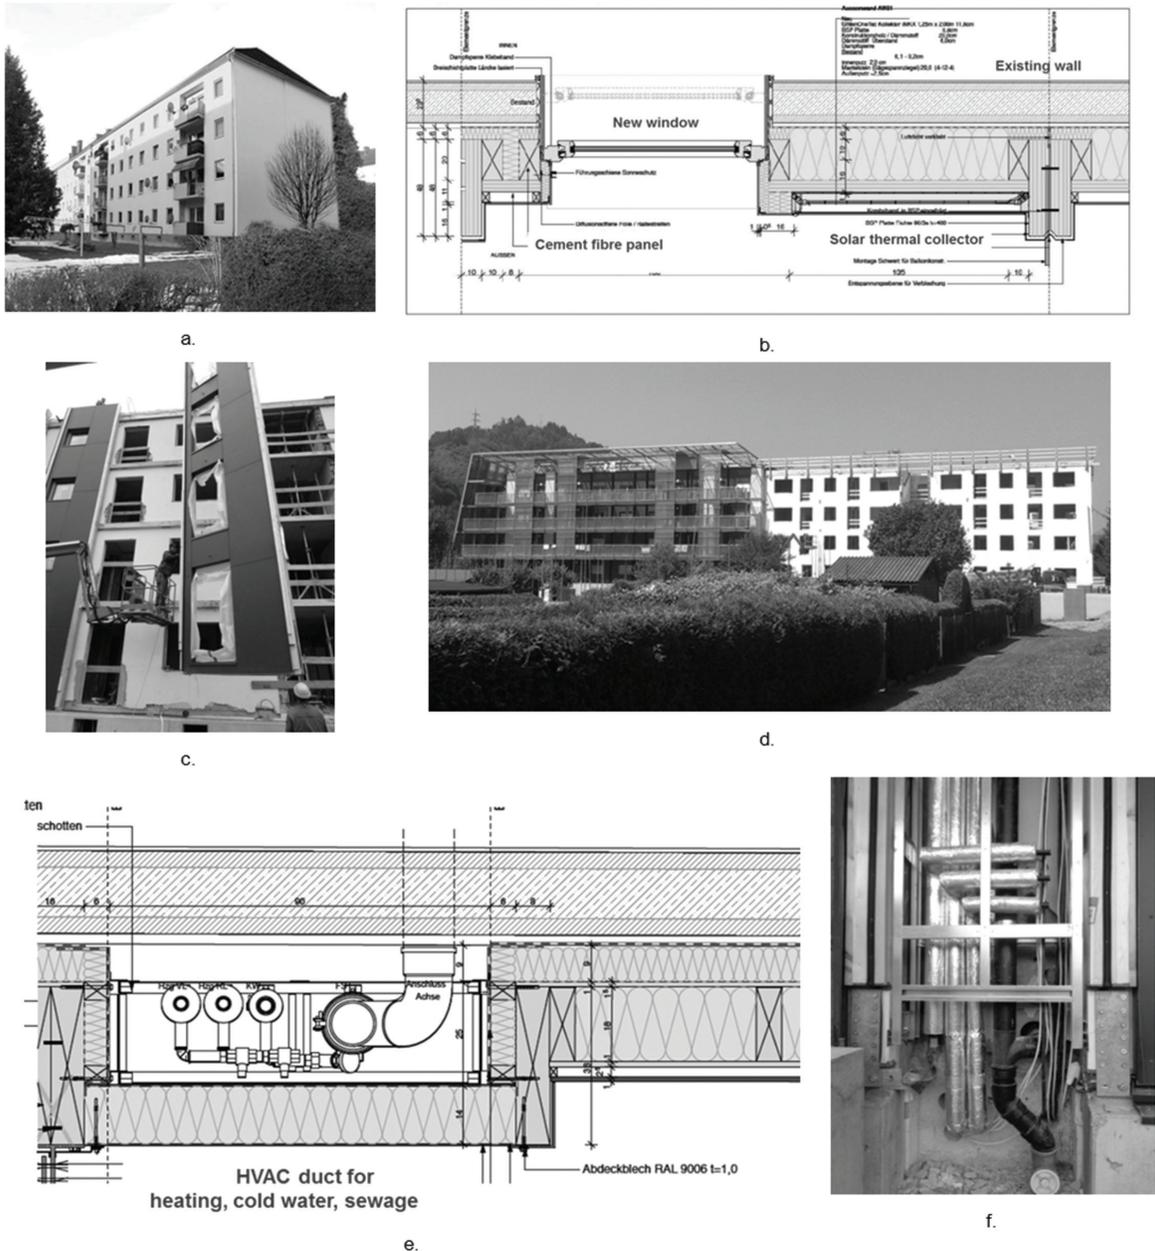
Renovation of a multistory housing block in the city of Kapfenberg. (a) Picture of the building prior to renovation. (b) Schematic of the wall section with new window and solar thermal collector. (c) Mounting of façade elements. (d) Renovated façade; (e–d) Schematic and picture of new HVAC system elements installed within the external façade (AEE INTEC and Nussmüller Architekten ZT GmbH 2015).
